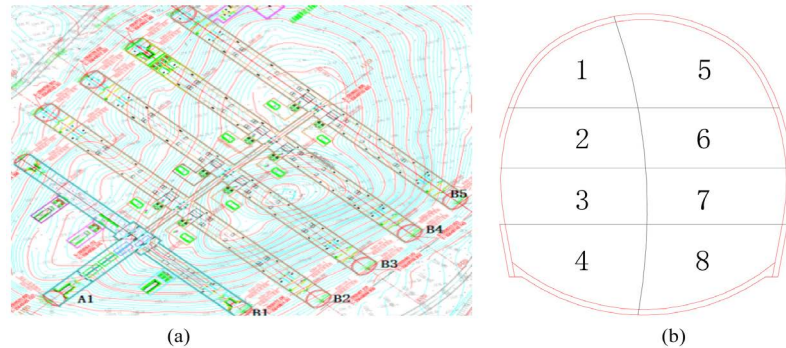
Overview of tunnel engineering. (a) Tunnel group plan, (b) Tunnel CD construction
